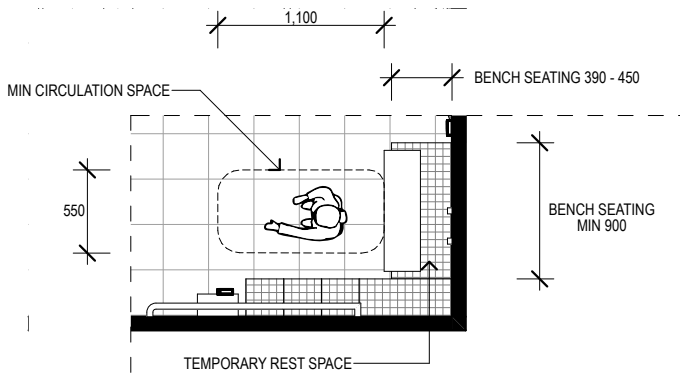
MENSTRUAL CRAMPS, PLAN
